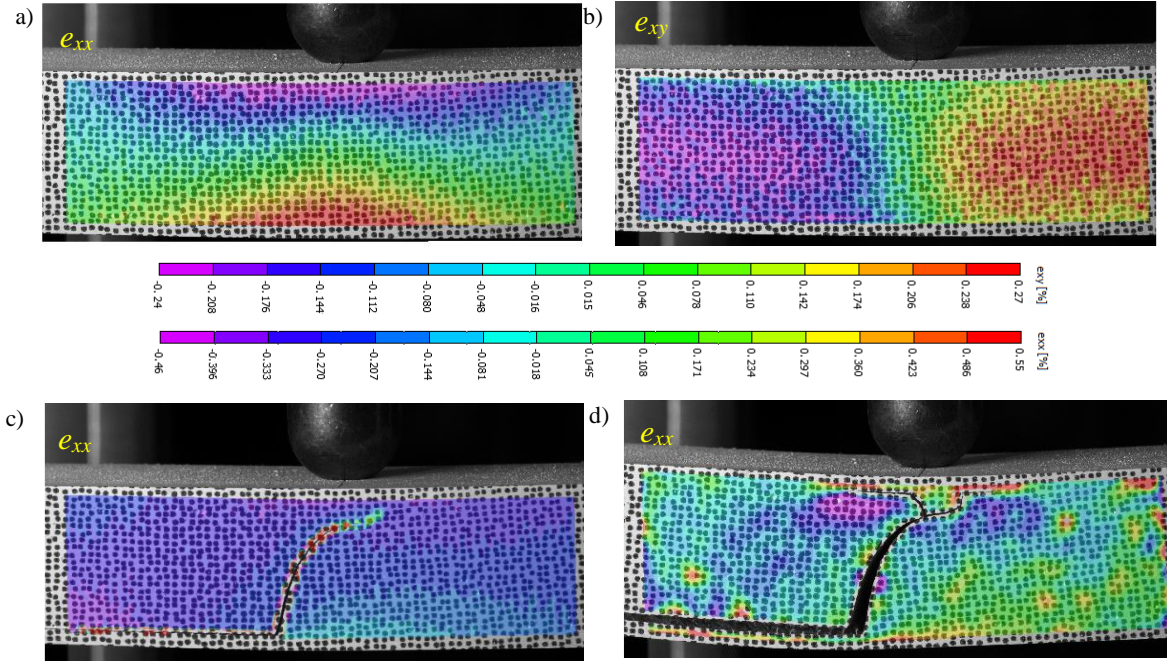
(a) Longitudinal strain field before failure, (b) shear strain field prior to failure, (c) failure mode corresponding to the first load drop and (d) failure mode corresponding to final failure
